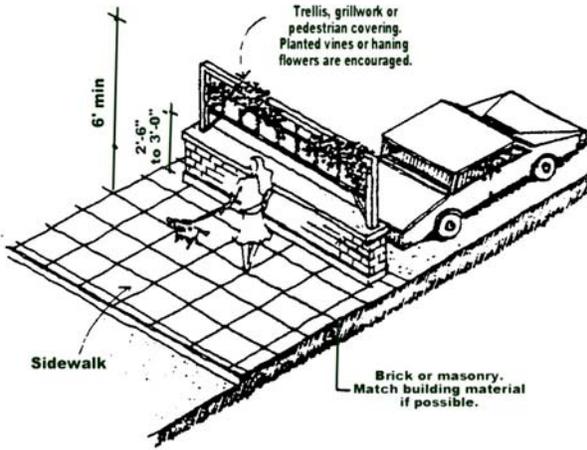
Low wall with trellis above hanging plant is ideal as a screening element for parking lots.
